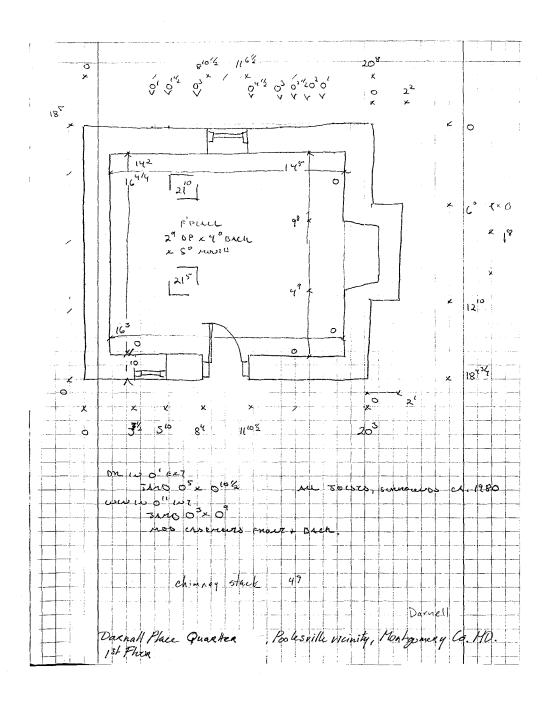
Darnall Farm Quarter, field notes for first floor plan
